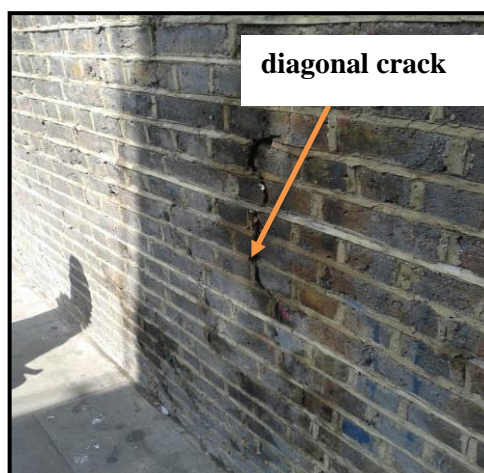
Diagonal crack to the northeast wing wall adjacent to the east abutment (LUL, principal inspection report 2013)
